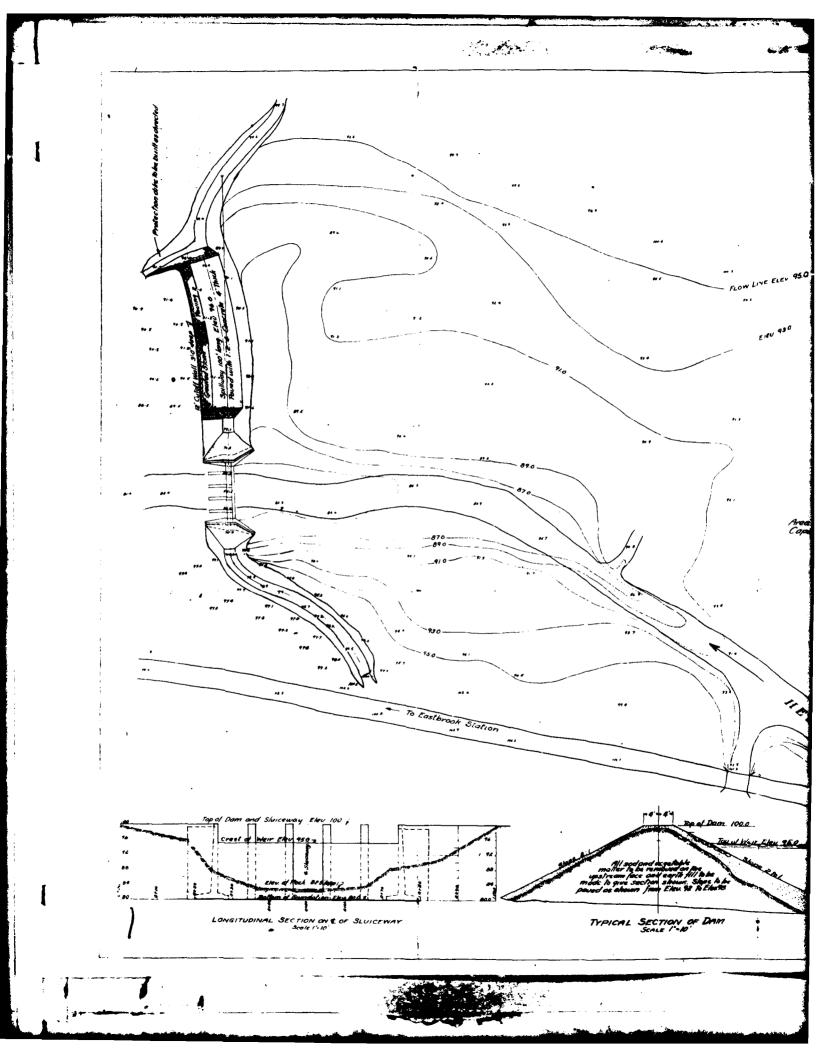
Plate IV "Elevation View of Spillway of Dam at Lakewood Beach," dated 29 May 1933.
